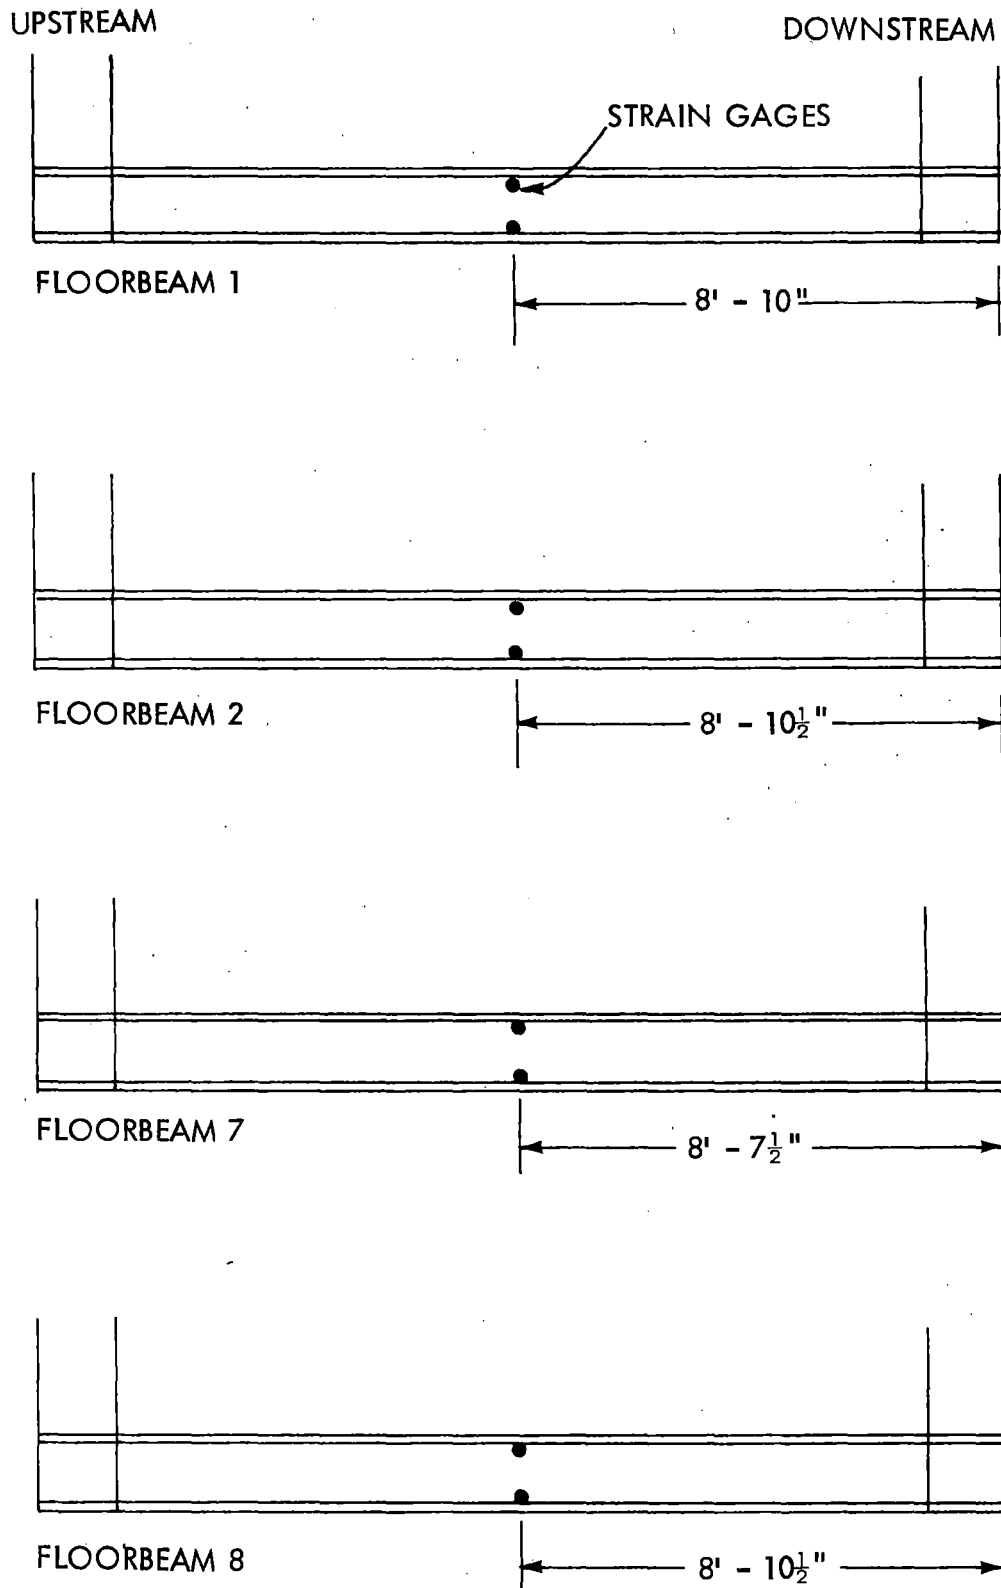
Location of strain gages on floorbeams in Span 2 - Hubby Bridge.
